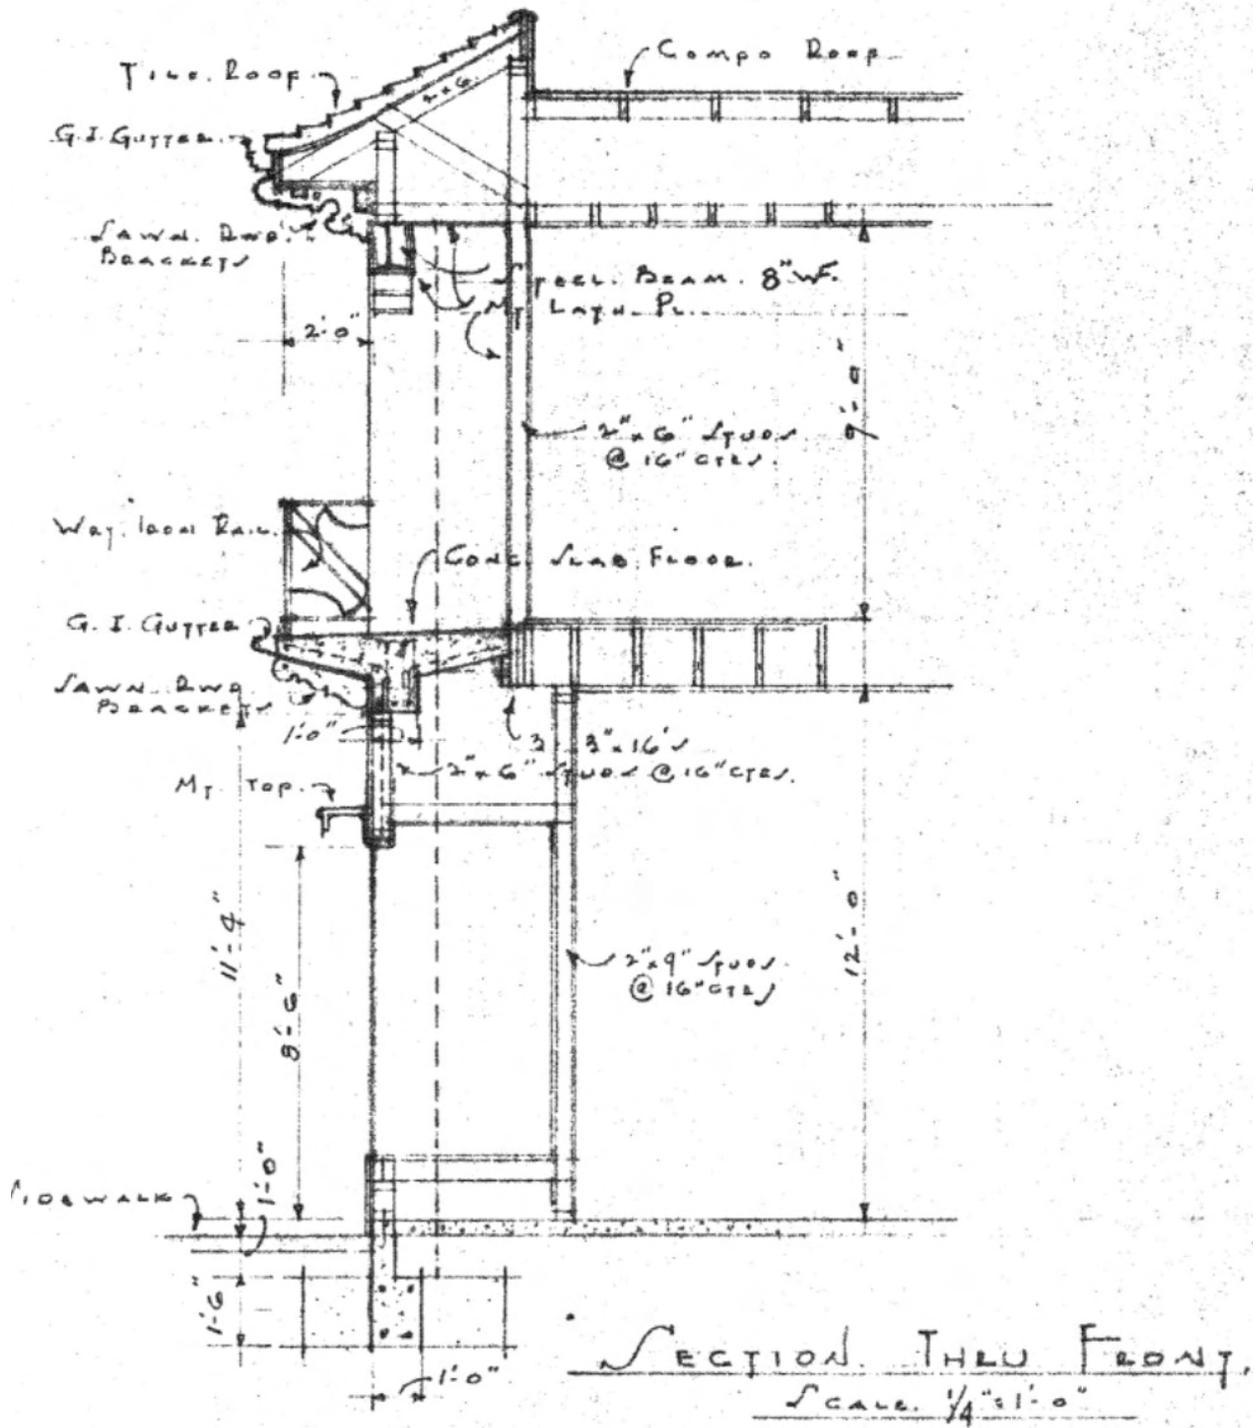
Original Building Drawings by Charles E. Butner, Architect, Section of 39 Soledad Street Facade.
